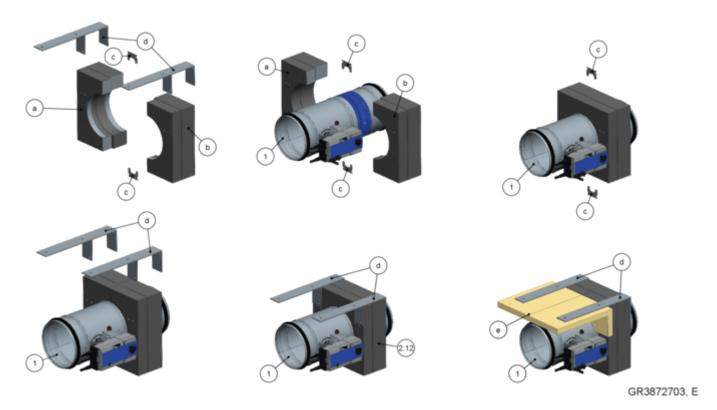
Scope of supply and installation of installation kit GL2 (steel bracket and cover to be provided by customer) for dry mortarless installation if there is no ceiling fixing on the rear side
